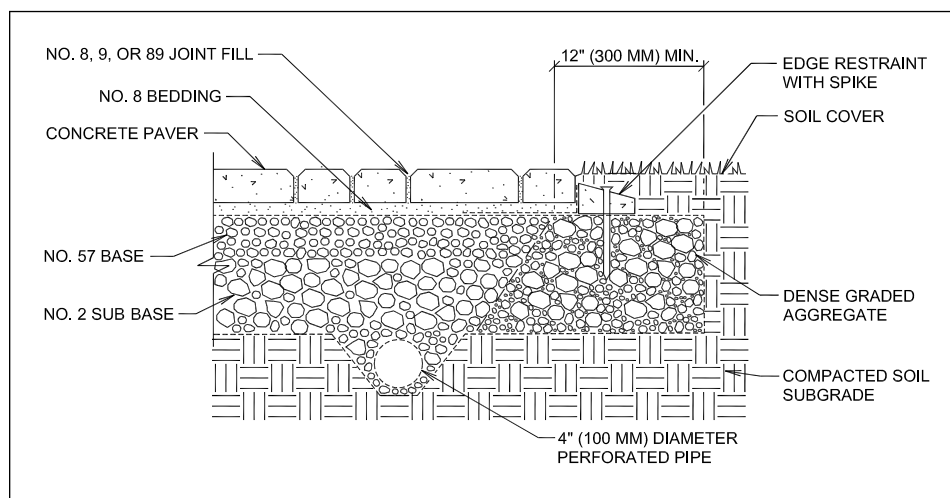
Typical cross section of a residential driveway using dense-grade base berms for anchoring edge restraints. Drainage at the lowest end (typically at the street) can be handled with a pipe running into the adjacent lawn with a pop-up drain at the surface.
